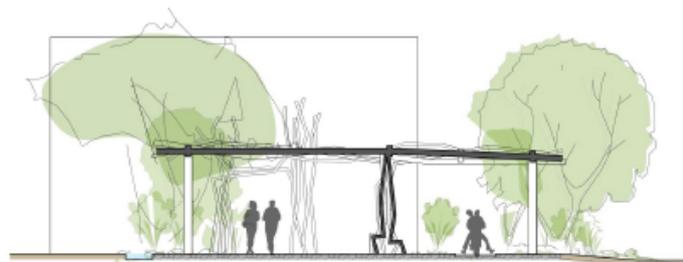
Sample shading paths to reduce the large scale on AUS Campus Plaza - Section (Source: author)
